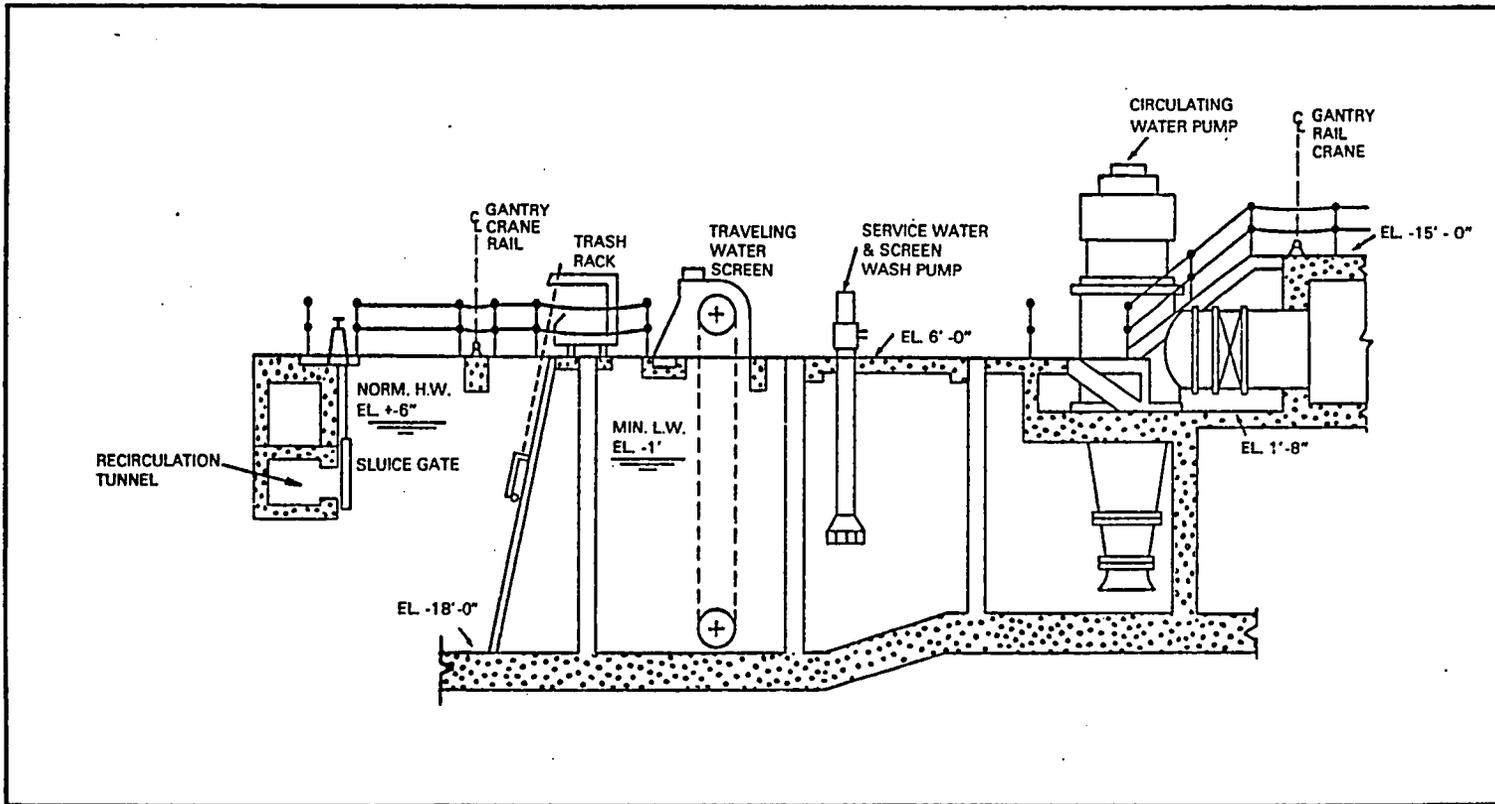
INTAKE STRUCTURE PLAN AT CENTERLINE OF RECIRCULATION TUNNEL
